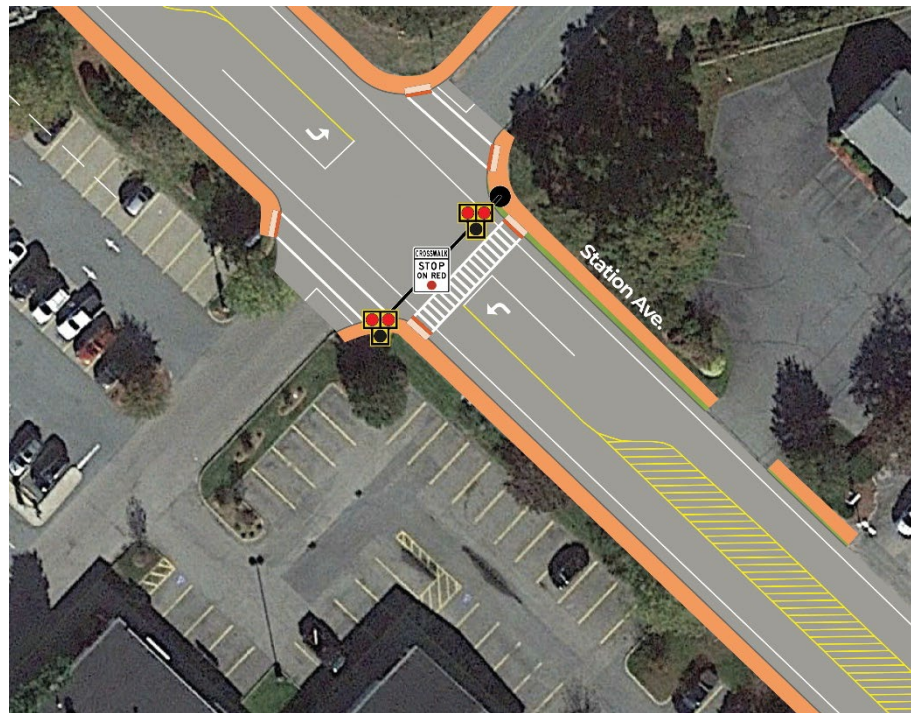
At-Grade Pedestrian Hybrid Beacon on Station Ave
